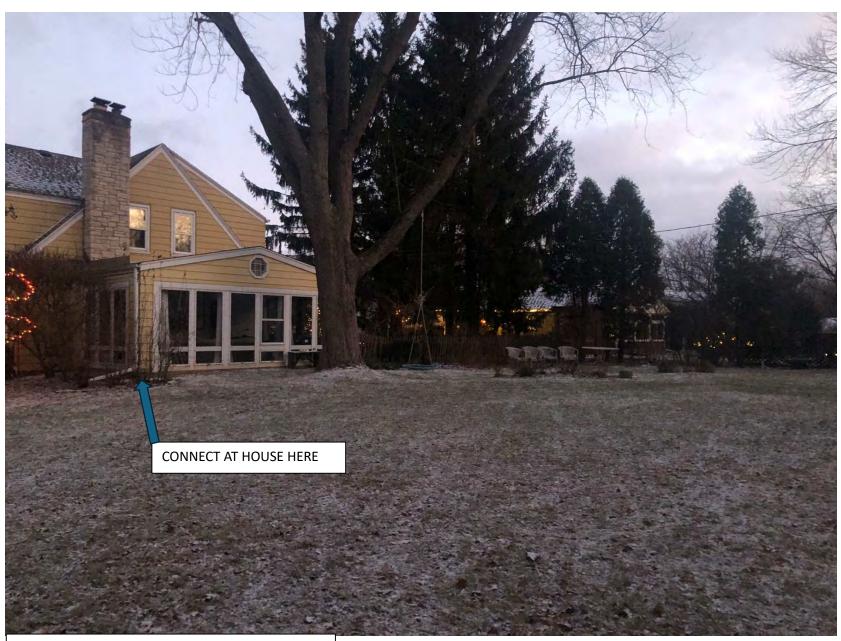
REAR SIDE YARD – FACING SOUTHEAST
